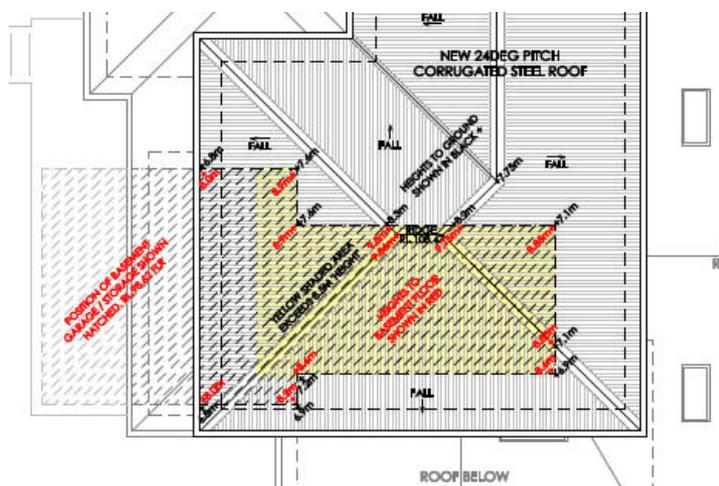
Roof plan showing building height notations (maximum 8.3m from ground level, maximum 9.86m where measured from basement floor level
